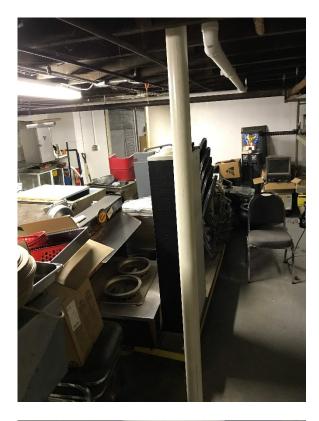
Looking at VMS fan and electrical connection. 11/21/18
